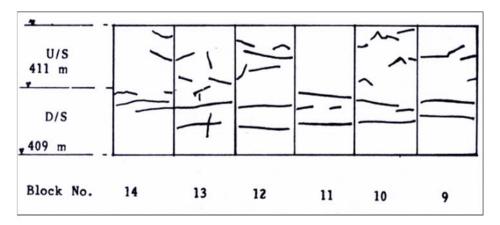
Konar dam. Disposition of cracks in topmost gallery
